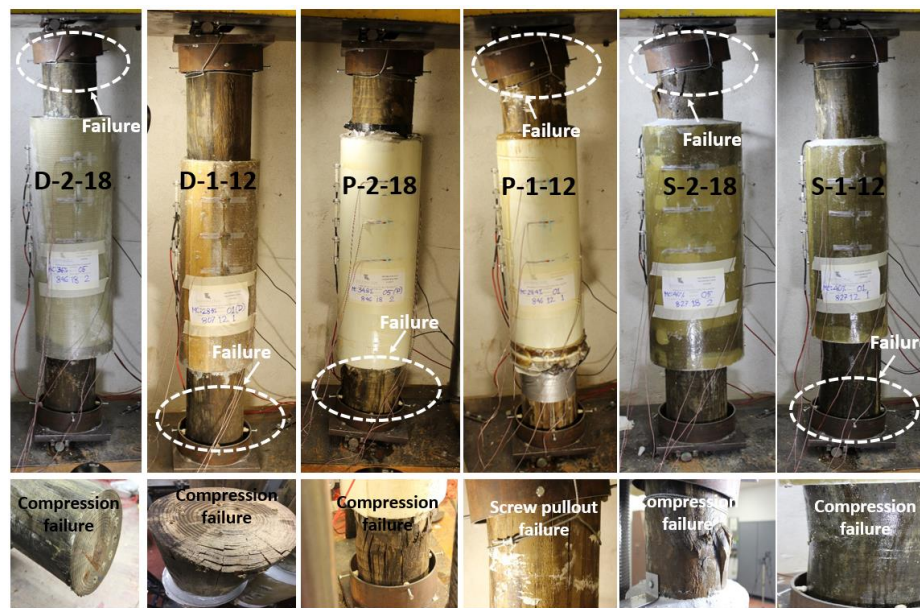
Testing of eccentrically loaded repaired timber piles and illustration of failure mode
